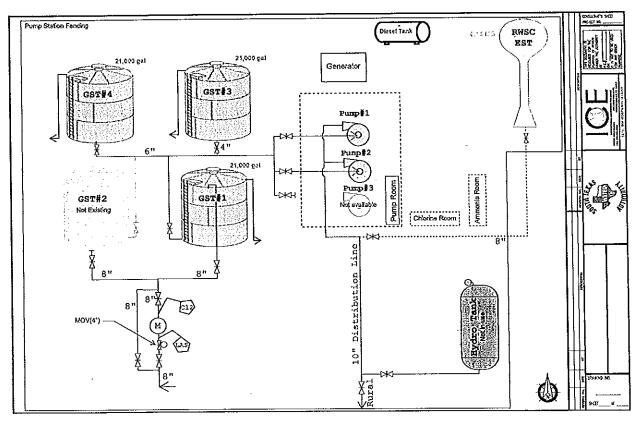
Ricardo PS#2 - Existing Pump Station Layout.
